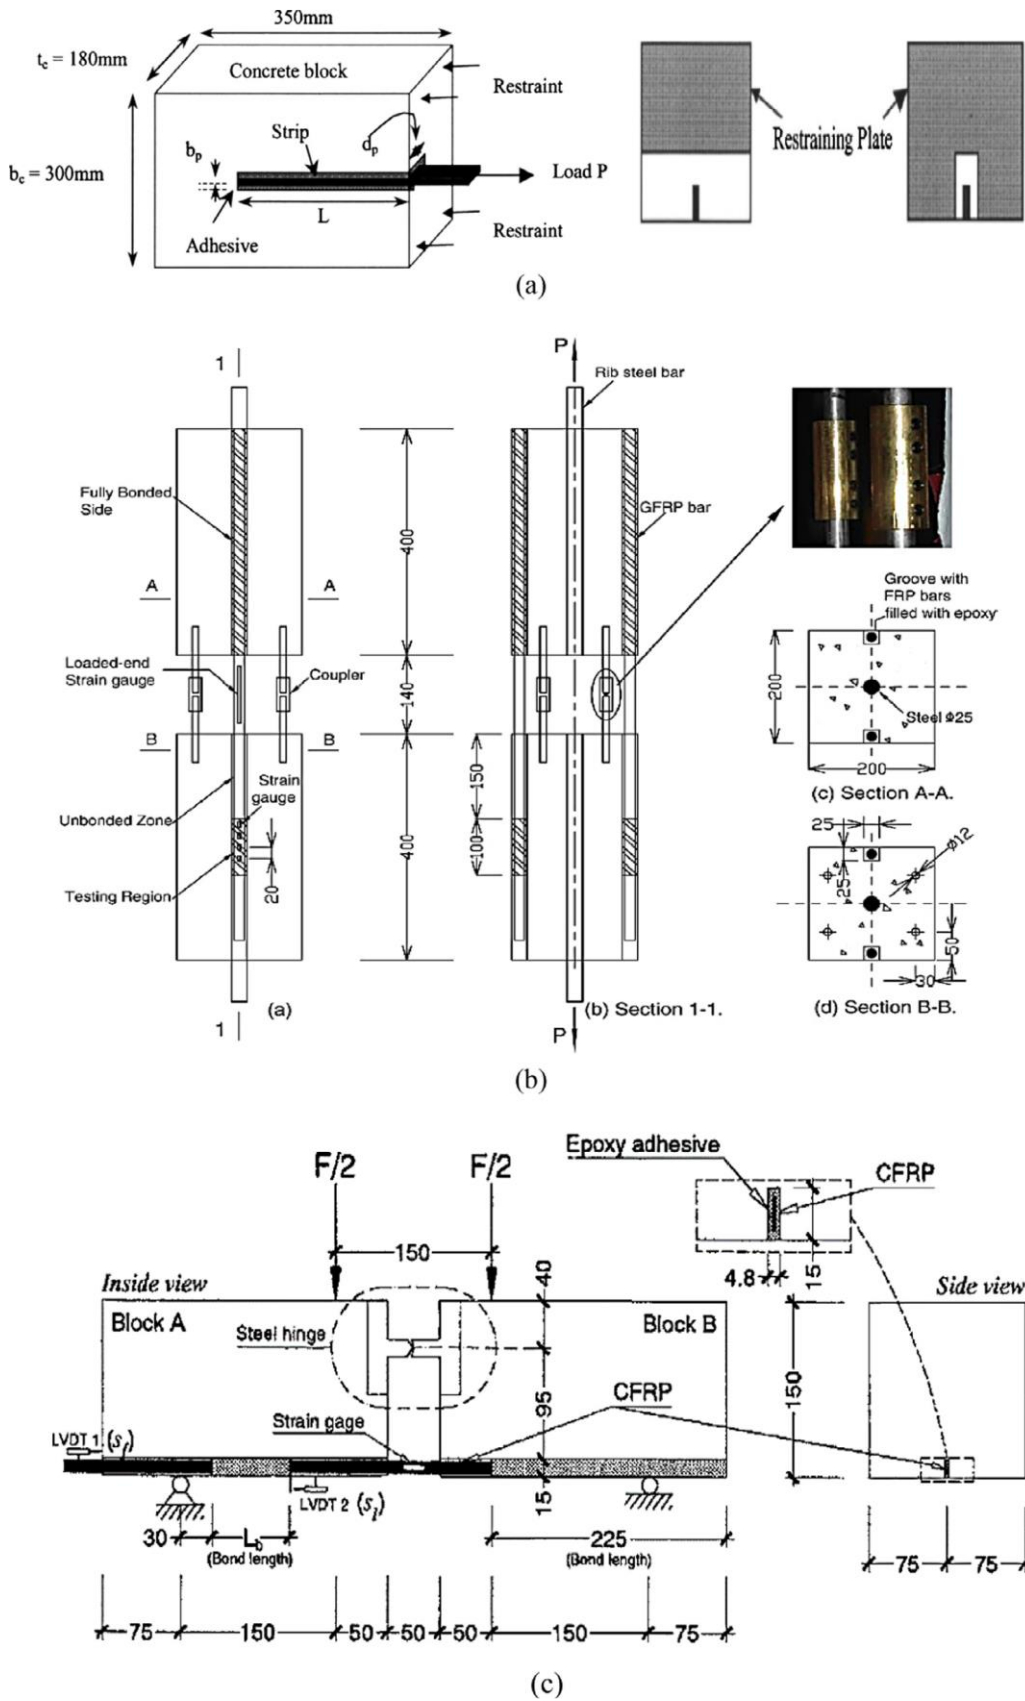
Typical test methods; (a) Pull-out direct single-face shear test [71], (b) Pull-out direct double-face shear test [72], (c) Beam pull-out test [73].
